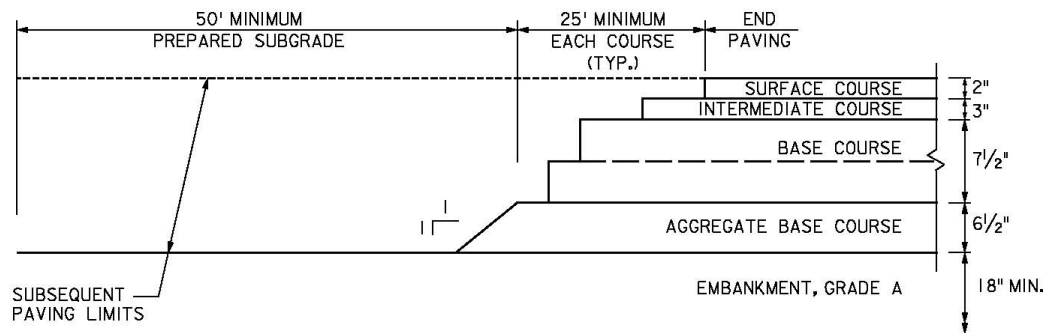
A - 9 TURNPIKE PAVEMENT (MAINLINE, RAMP & SHOULDERS)
